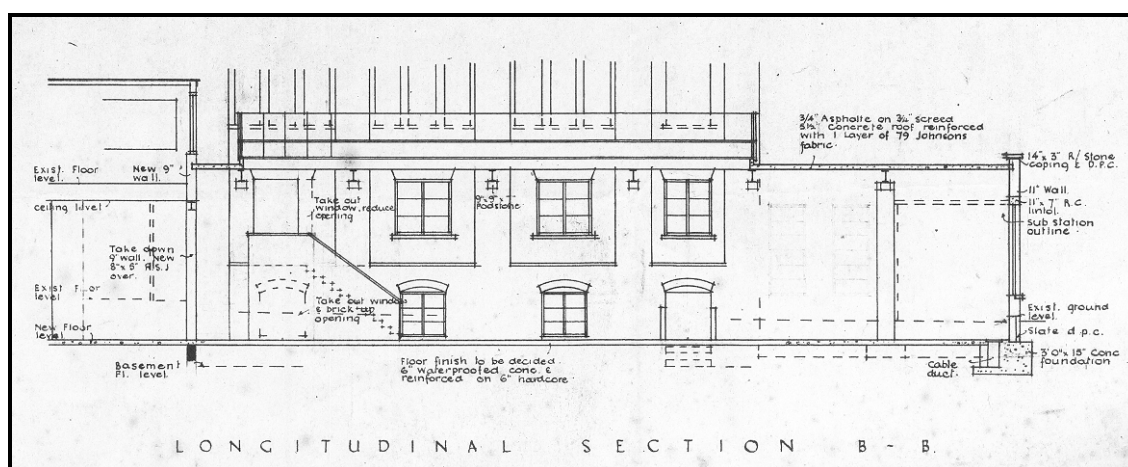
Proposed new tunnel kiln structure adjacent to the south elevation of Building J in 1951 (WPM)
